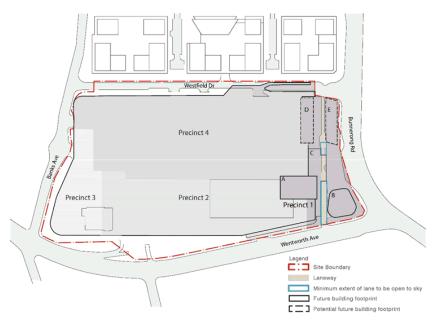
Plan showing areas of the new laneway to be designed to be opened to the sky
